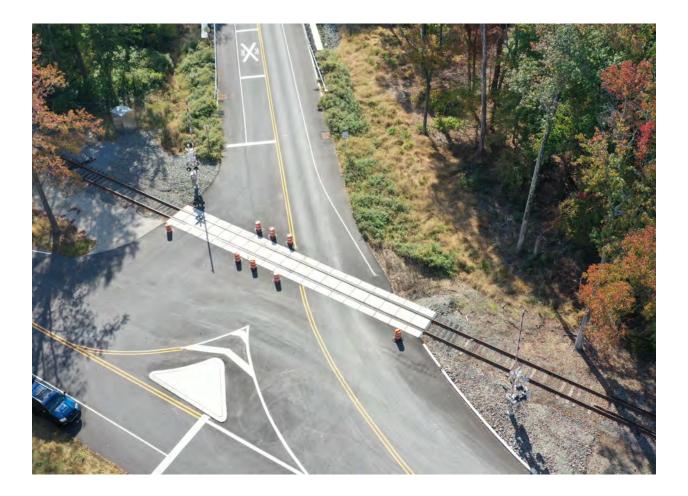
Proposed railroad grade crossing at connection to existing A-Line Road.
